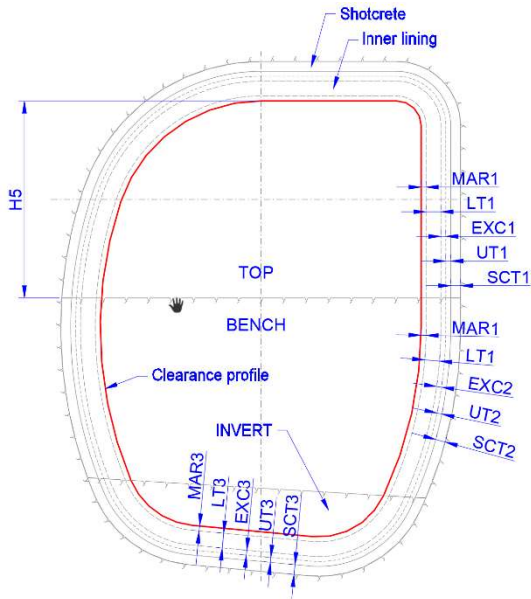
Cross section Type 6, phase 1, 2 and 3 excavation (EXPH=4)
